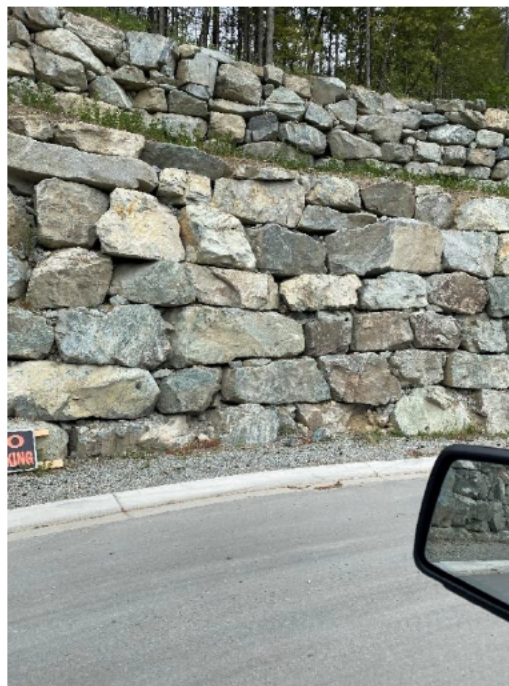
Local retaining wall example 6 of 6. Developer built wall in Sunstone for road access. As all hillside developments will require road access, so do homes. Lots sloping in two directions require retaining across the slopes from a high wall to a low wall in order to use the lot efficiently.
